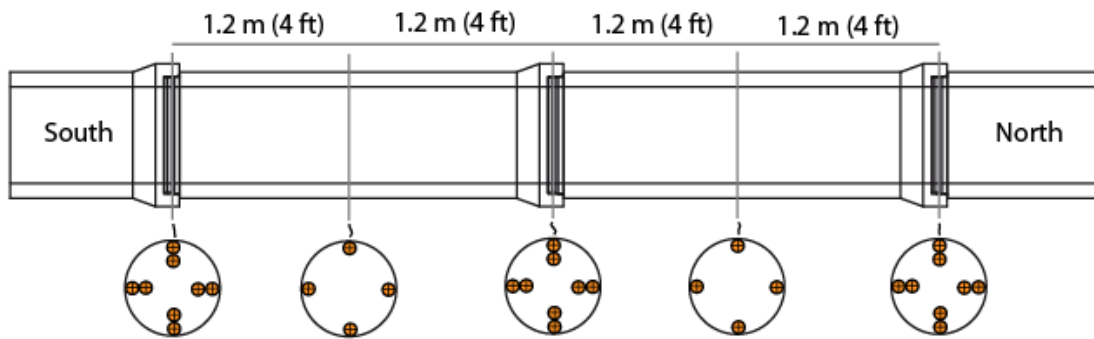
Location of reflective prisms in the 24 in (610mm) diameter reinforced concrete pipe.
